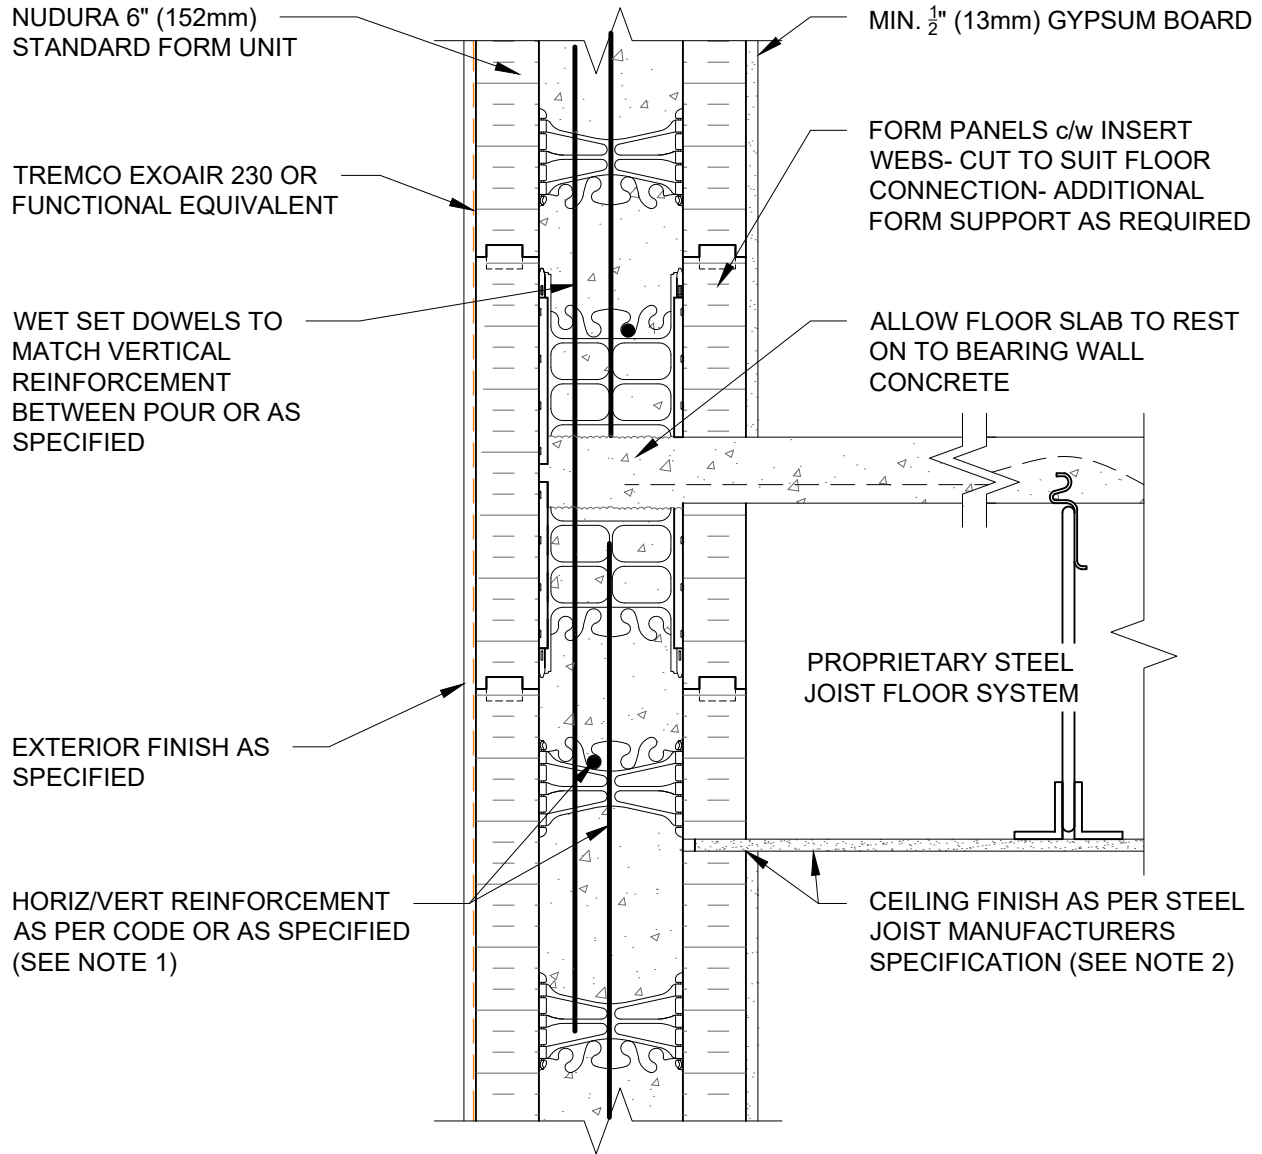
" (152mm) Form Unit, Steel Joist Floor System, Intermediate Floor Connection, Exterior Wall, Exterior Finish As Specified
